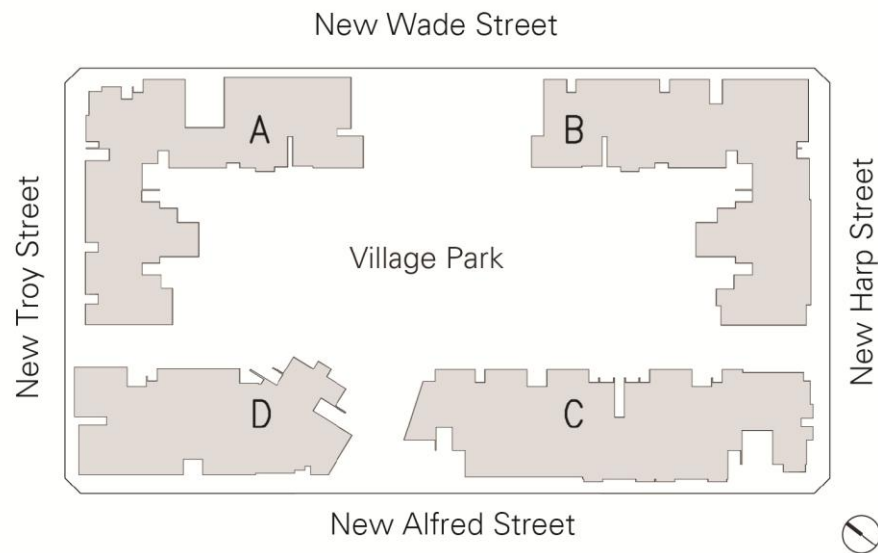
Street Naming Strategy for Proposed Lot 41 as per Concept Plan Approval
